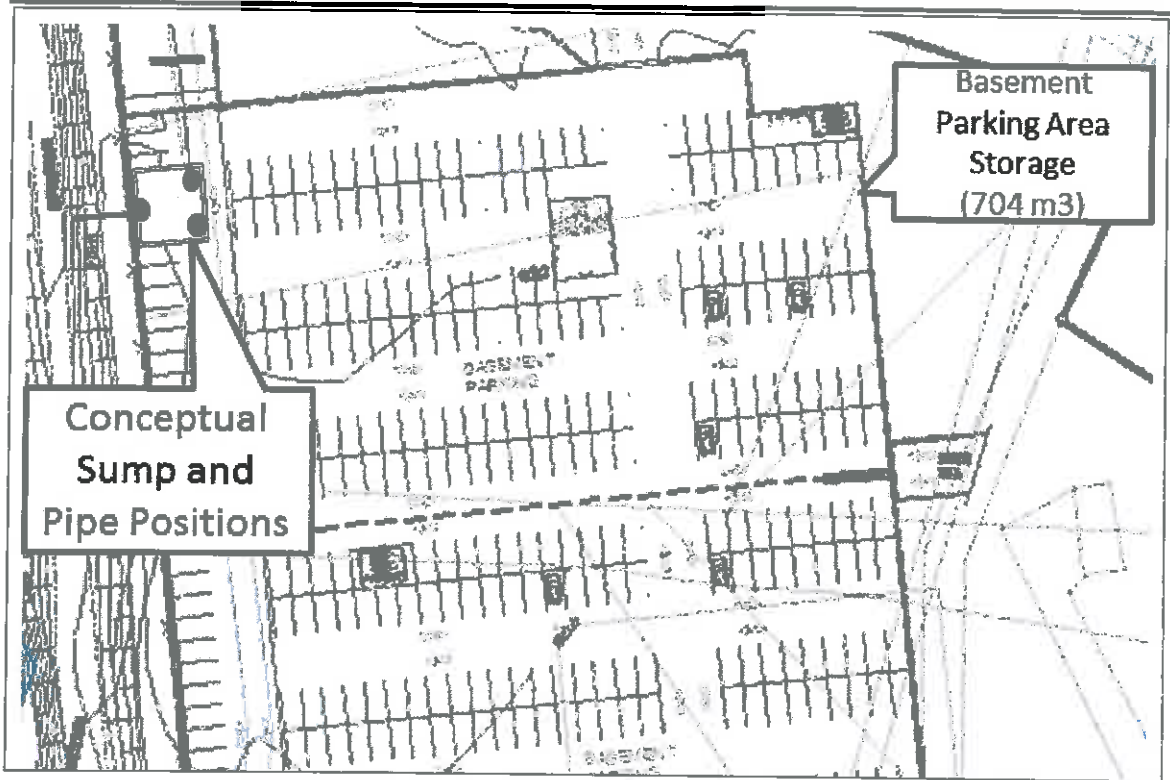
Conceptual Plan View of the Basement Level SWMP Infrastructure
